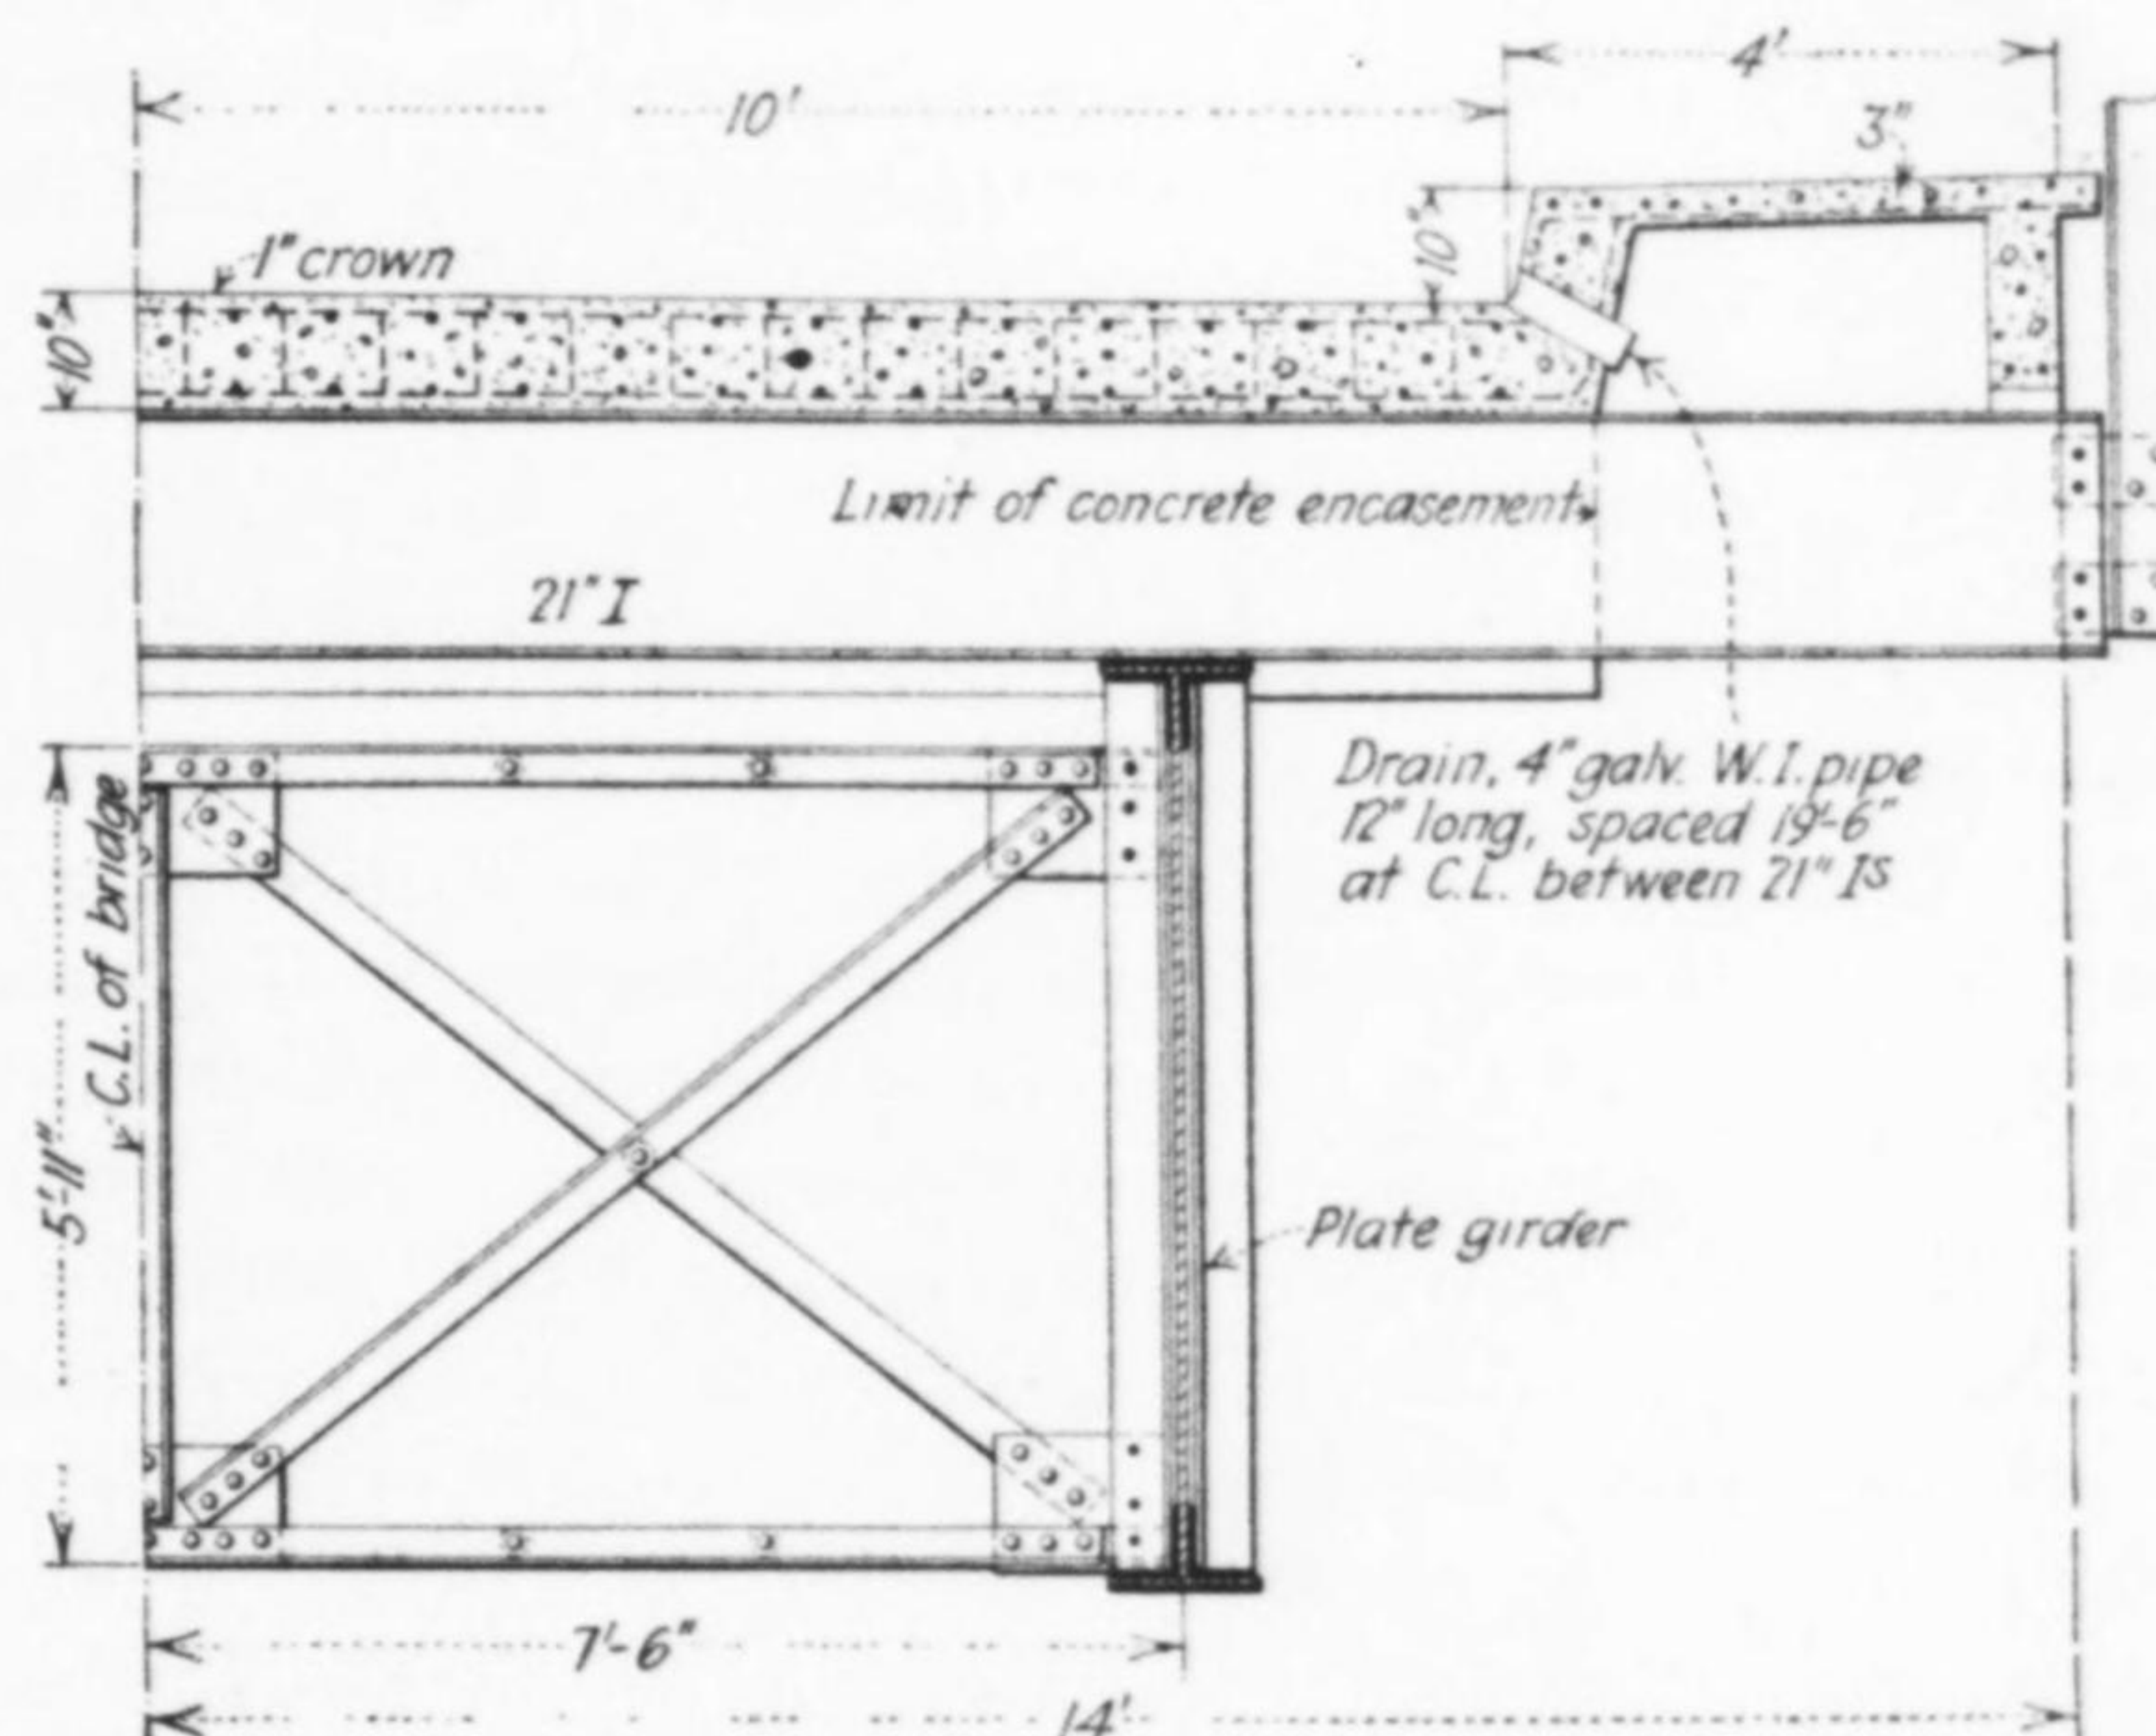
DECK CONSTRUCTION ON GIRDER SPANS
